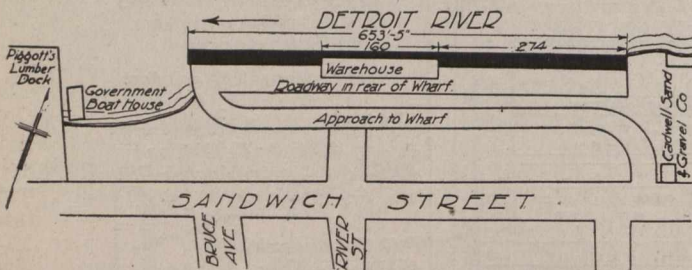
Detail Plan of Location of Government Wharf at Windsor.
